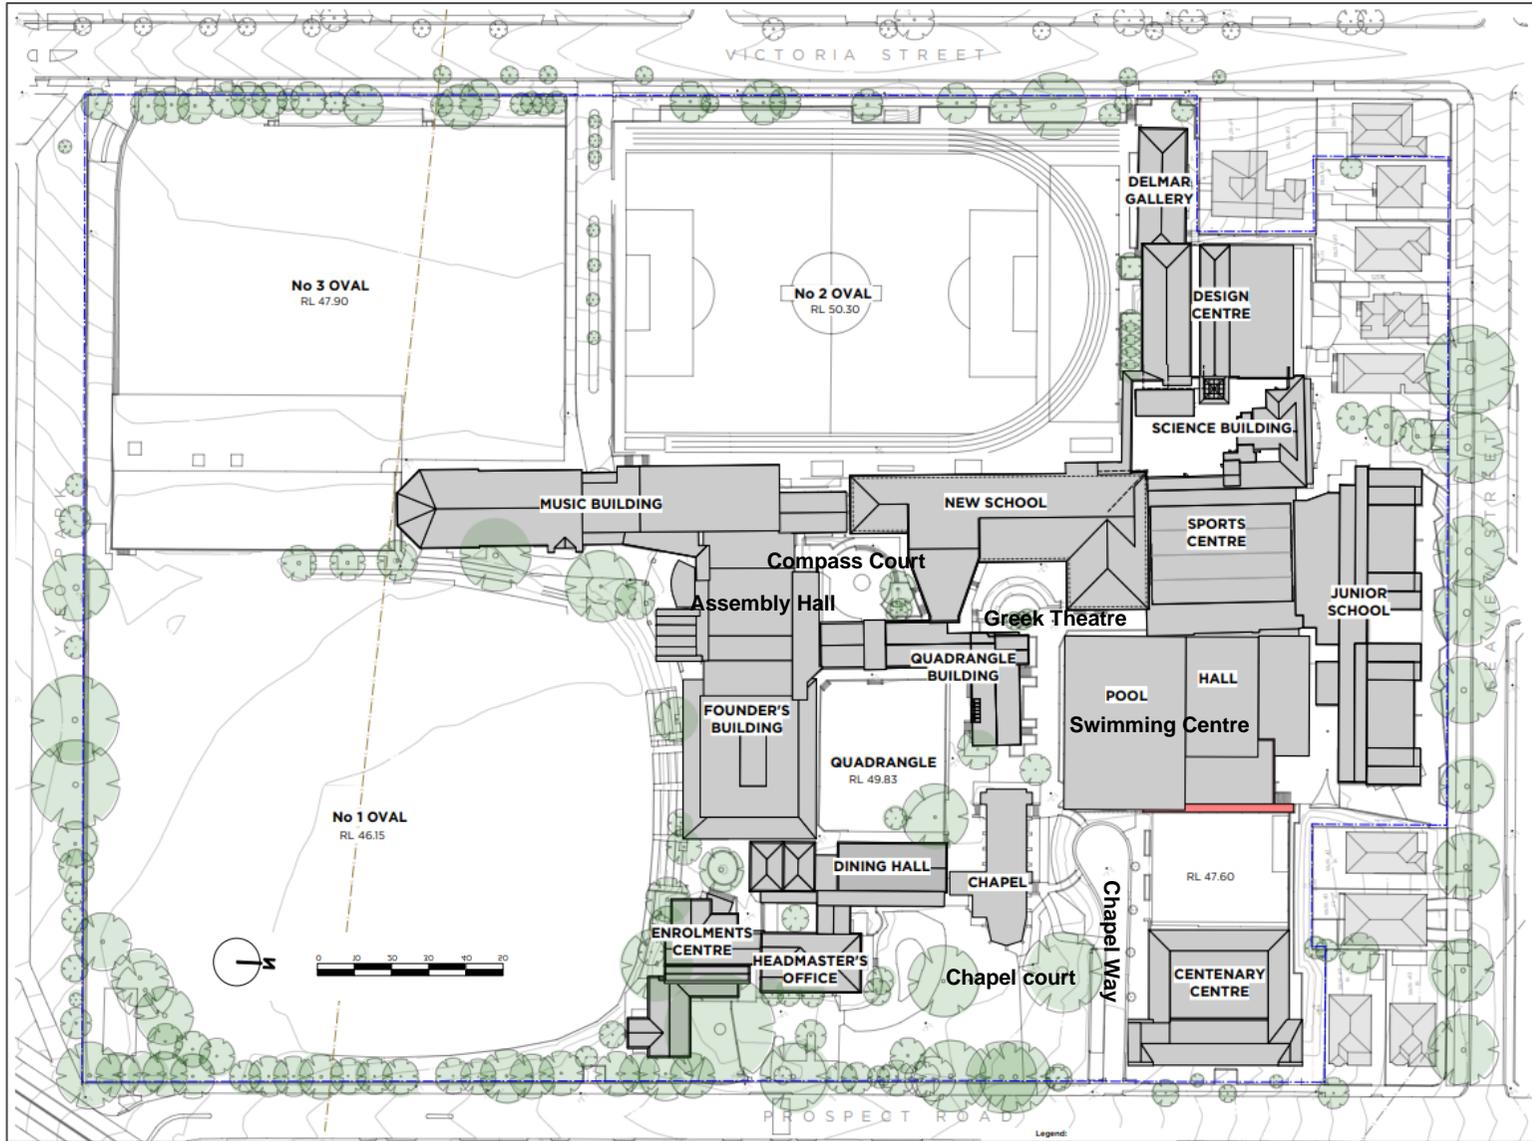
| Existing buildings and landscape features of the site (Source: Applicant's RtS 2020)
